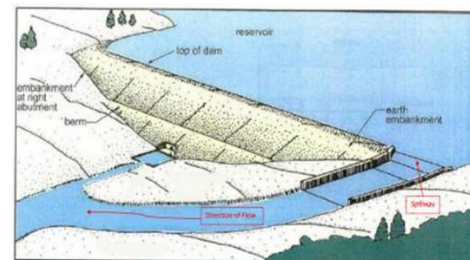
Schematic view of an earth dam showing the reservoir, embankment, berm, and spillway arrangement
